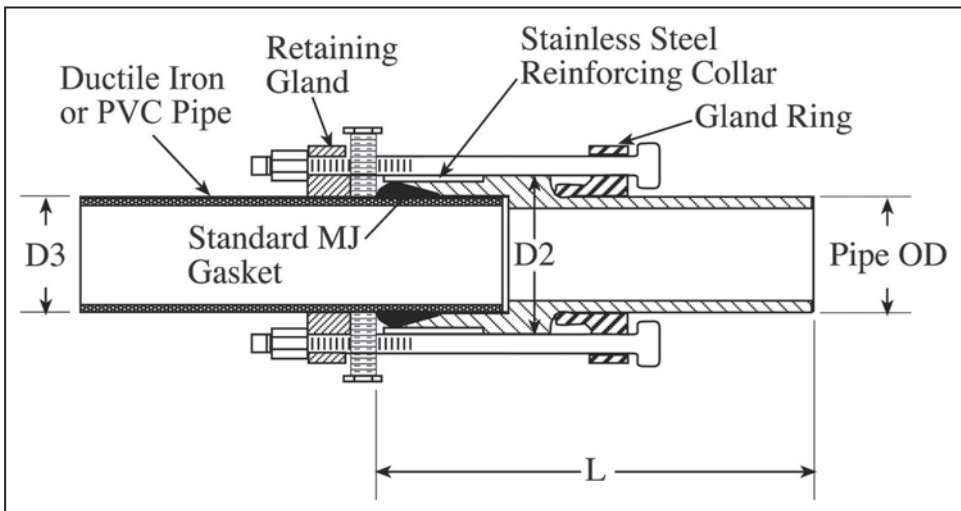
Connection to Existing PVC or DI Pipes Using Female MJ Adapter
